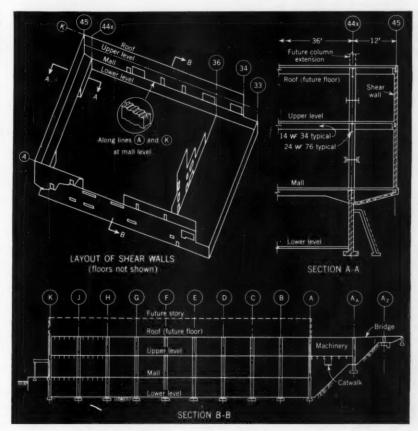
Layout of shear walls for Eaton's of Canada, with floors shown in cross section.
